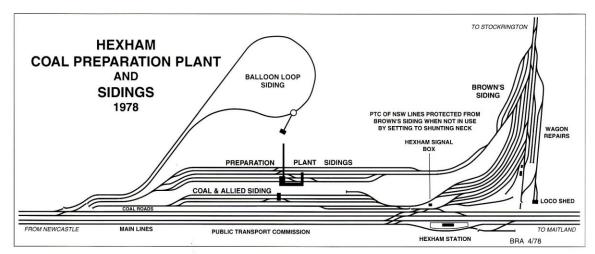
Plan of the site, re-drawn by Brian Andrews.
